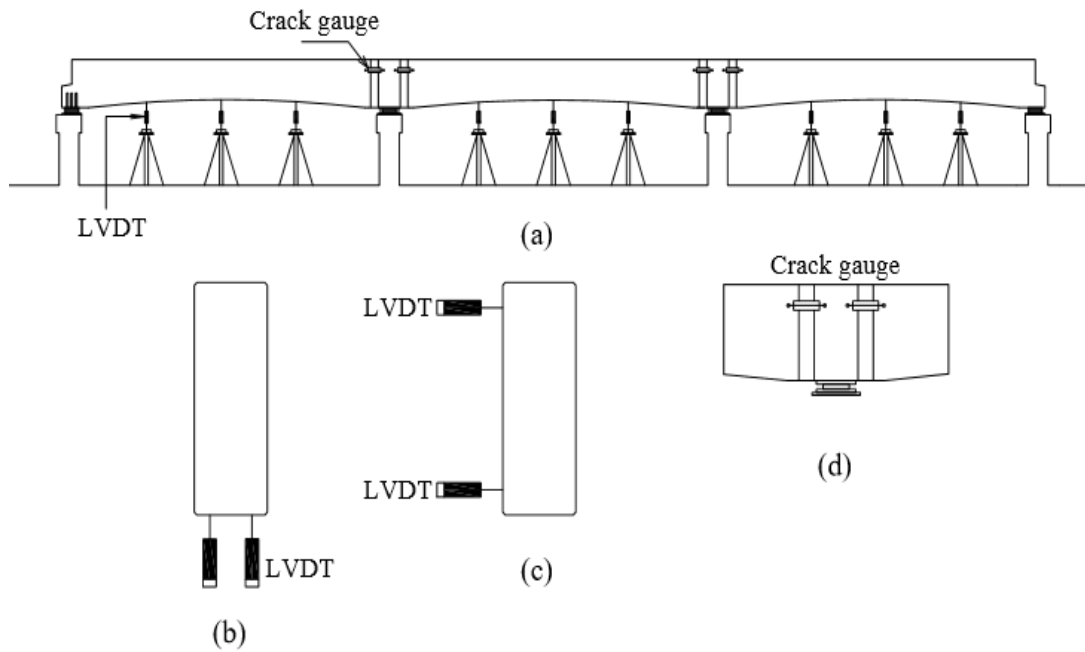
Typical details of LVDTs and crack gauges (a) overall display, (b) section at mid location, (c) section at pier segment, and (d) display of crack gauges.
